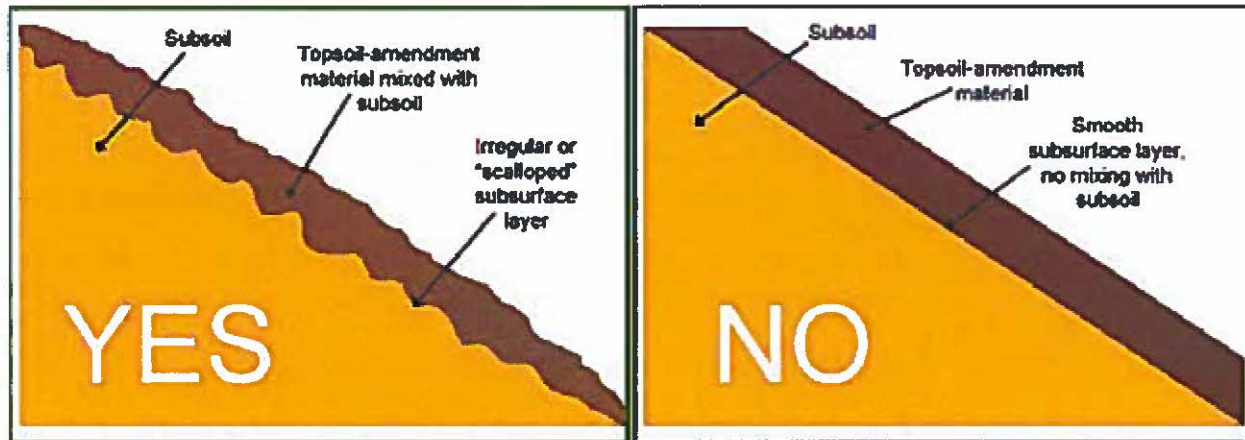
Topsoil amendment applied and mixed with subsoil, creating a scalloped subsurface layer (left). Typical topsoil amendment application without mixing with subsoil (right). Source: Watershed Management Guidebook (Drake & Hogan, 2013).¹
